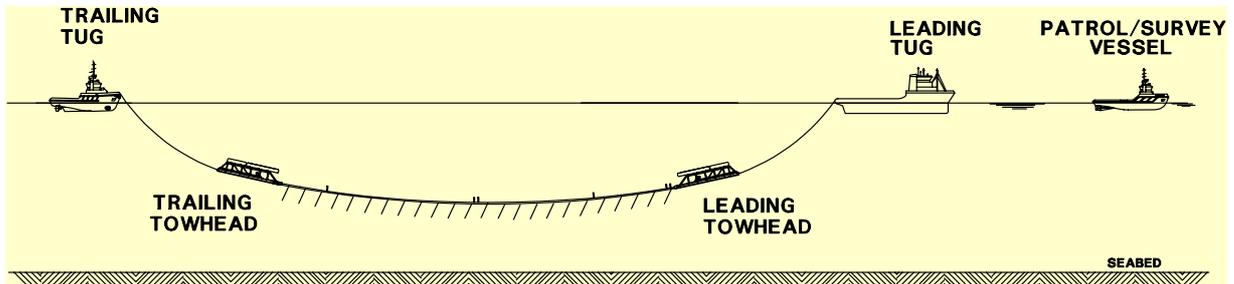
Pipeline and Riser Installation Illustration – Towing
